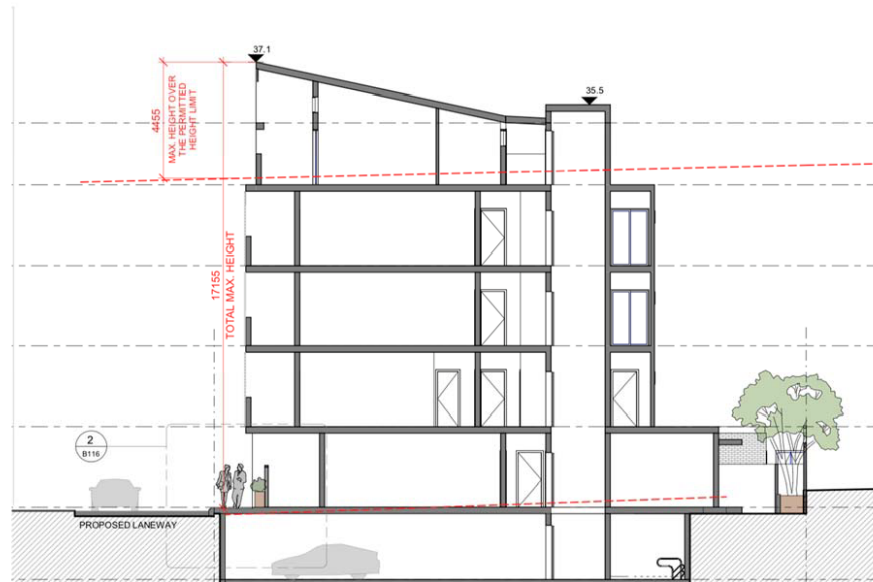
of the proposed building showing the 12.5m height limit as red dotted line
